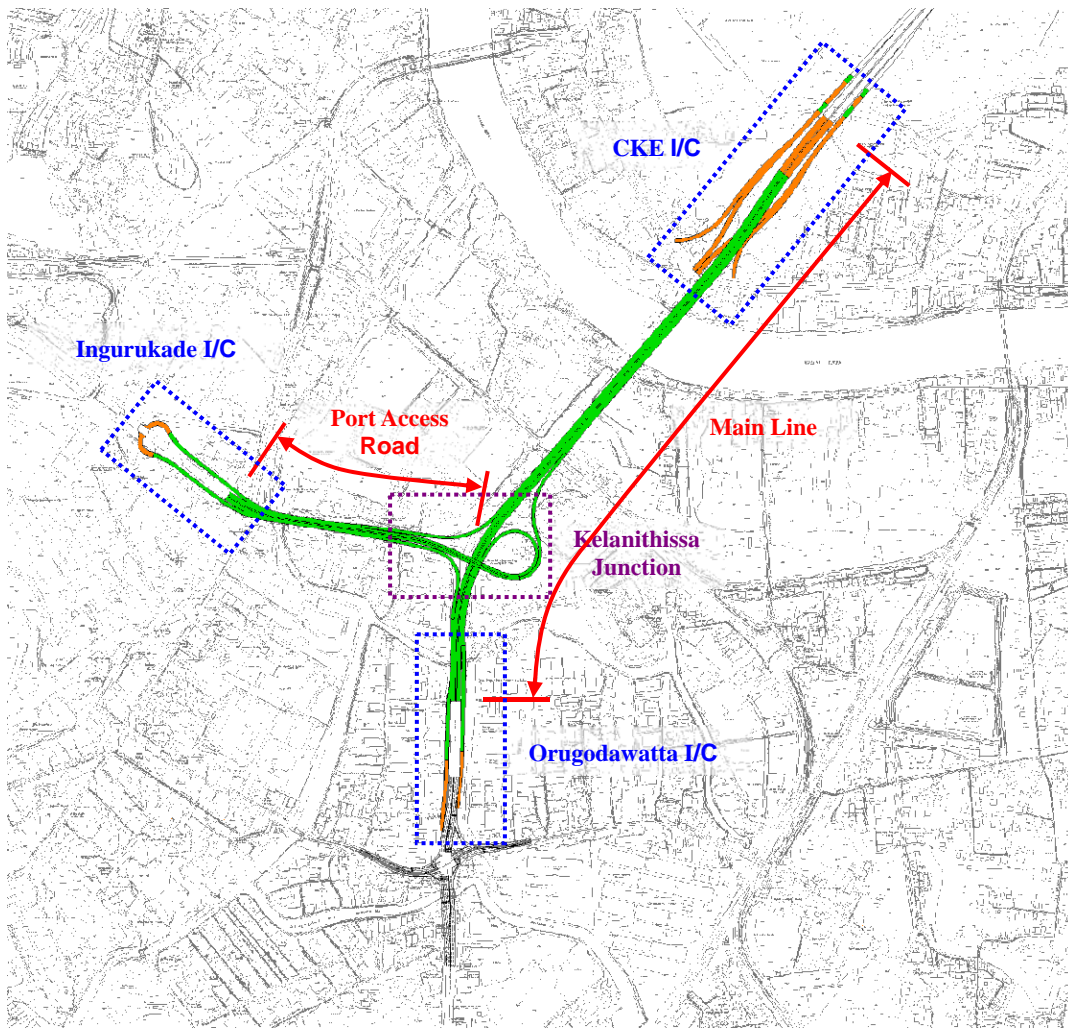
Kelanithissa Intersection Improvement Plan
